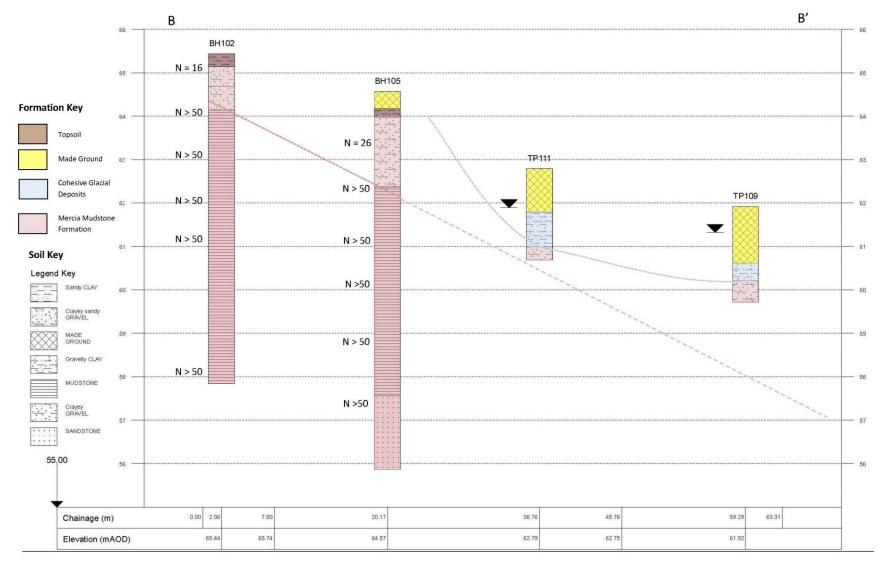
Cross Section. Vertical Scale 1:72, Horizontal Scale 1:342.
